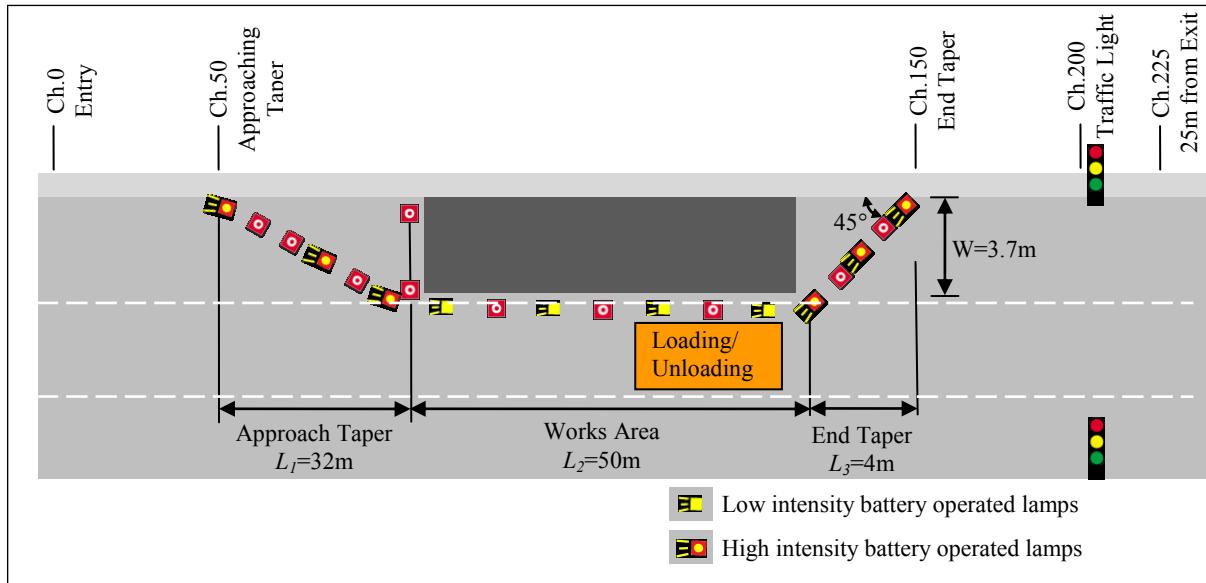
TTA plan of Temporary Loading / Unloading Beside a Microtunneling Site
